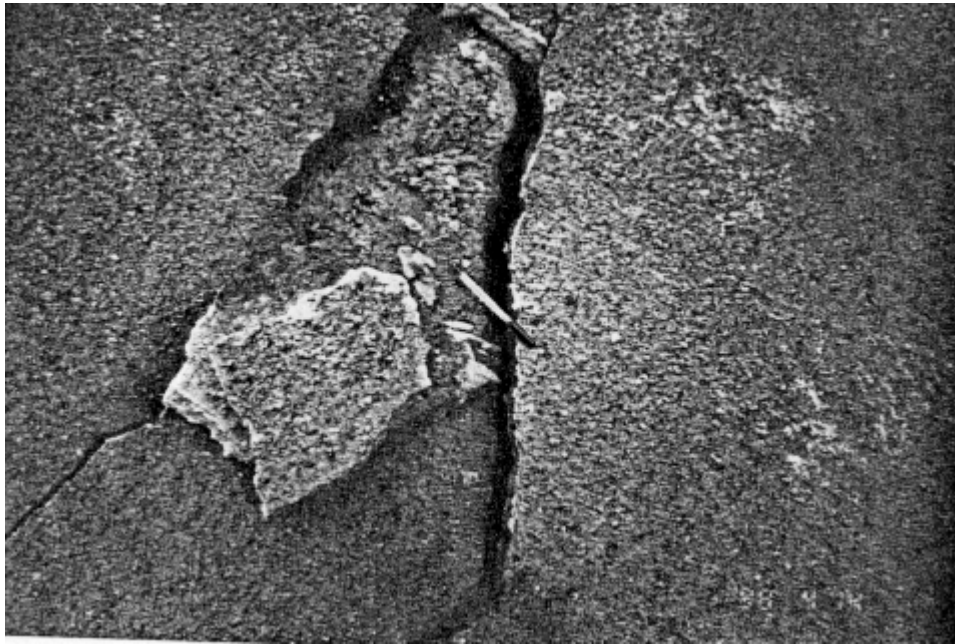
Cracking in Shotcrete at North-western Zone of Bulging
